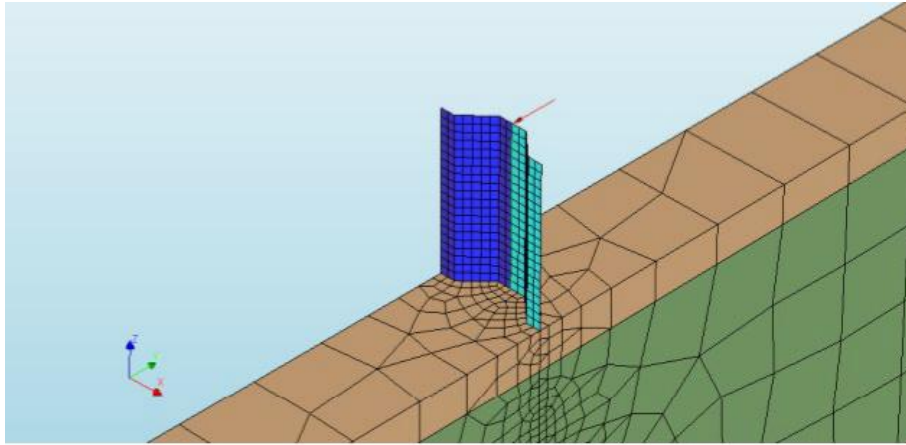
Illustration of full 3D sheet pile model including wall and soil
